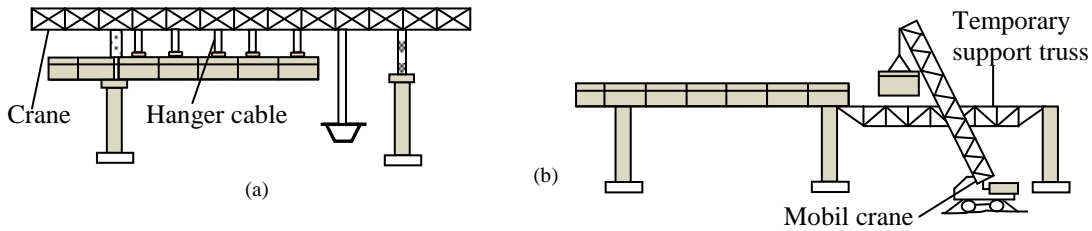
Construction methods with stepwise segments, (a) methods with cable hanger; (b) support truss
